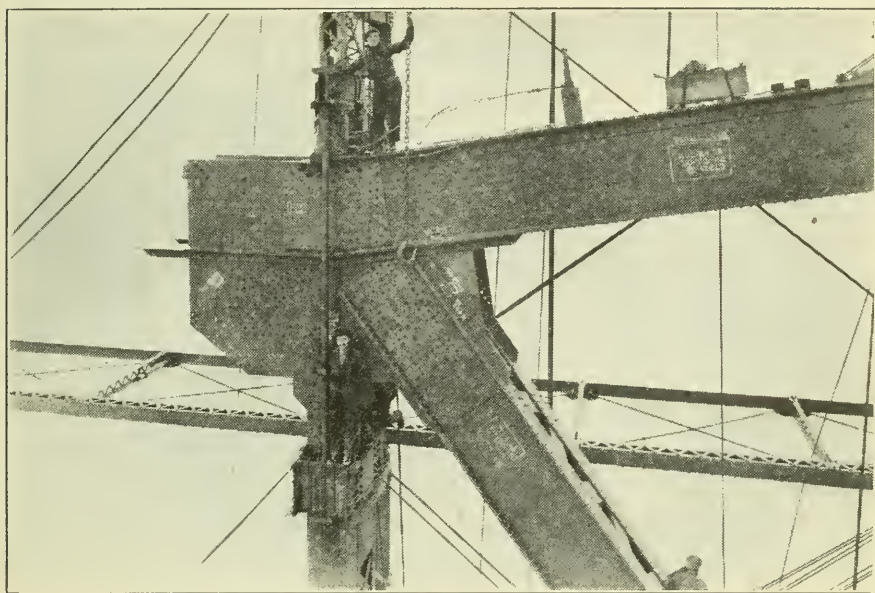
SPECIAL JACKING APPARATUS, SCIOTOVILLE BRIDGE.
